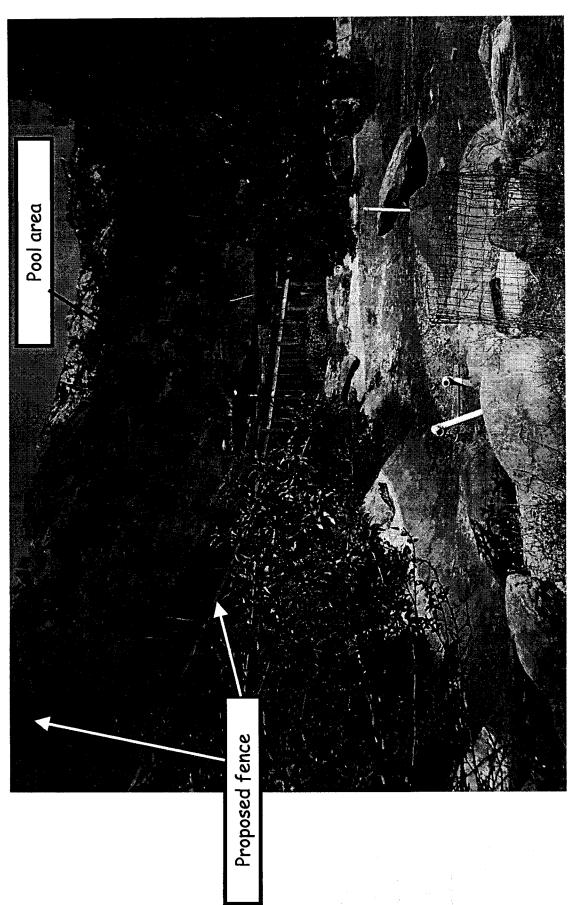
CDP 4-99-016-A2 Photo – Proposed Fencing
